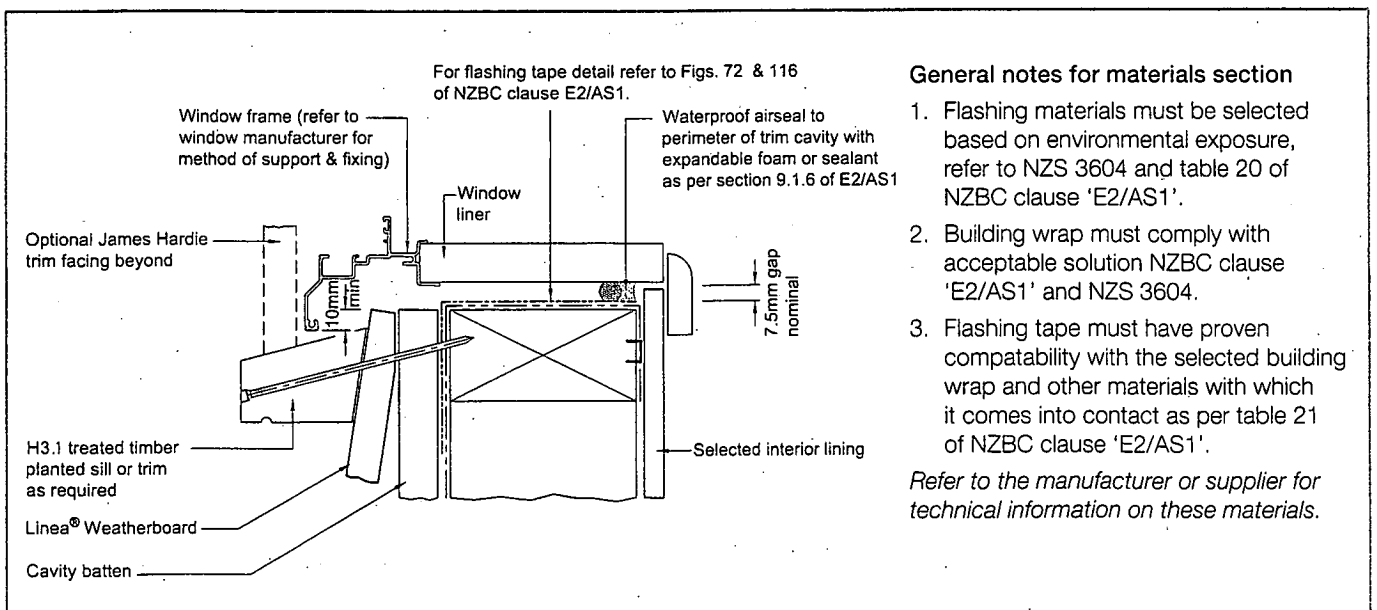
CAVITY WINDOW SILL WITH FACINGS
